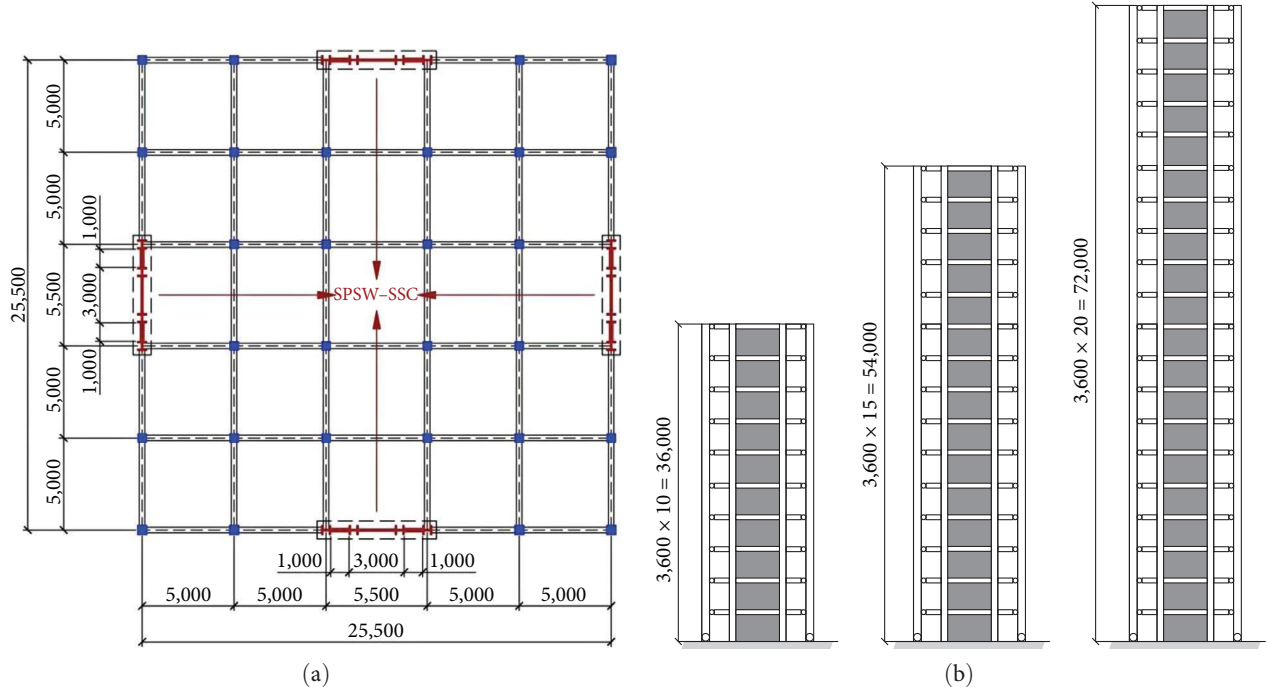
Prototype structures of SPSW-SSC coupled system: (a) floor plan and (b) elevations.
